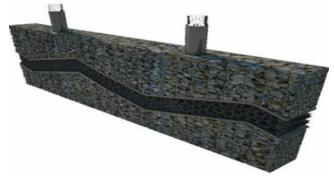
Perspective shot of the first proposal. The use of drainage pipes as columns with gabion baskets around them. Source: Designed and drawn by the author
